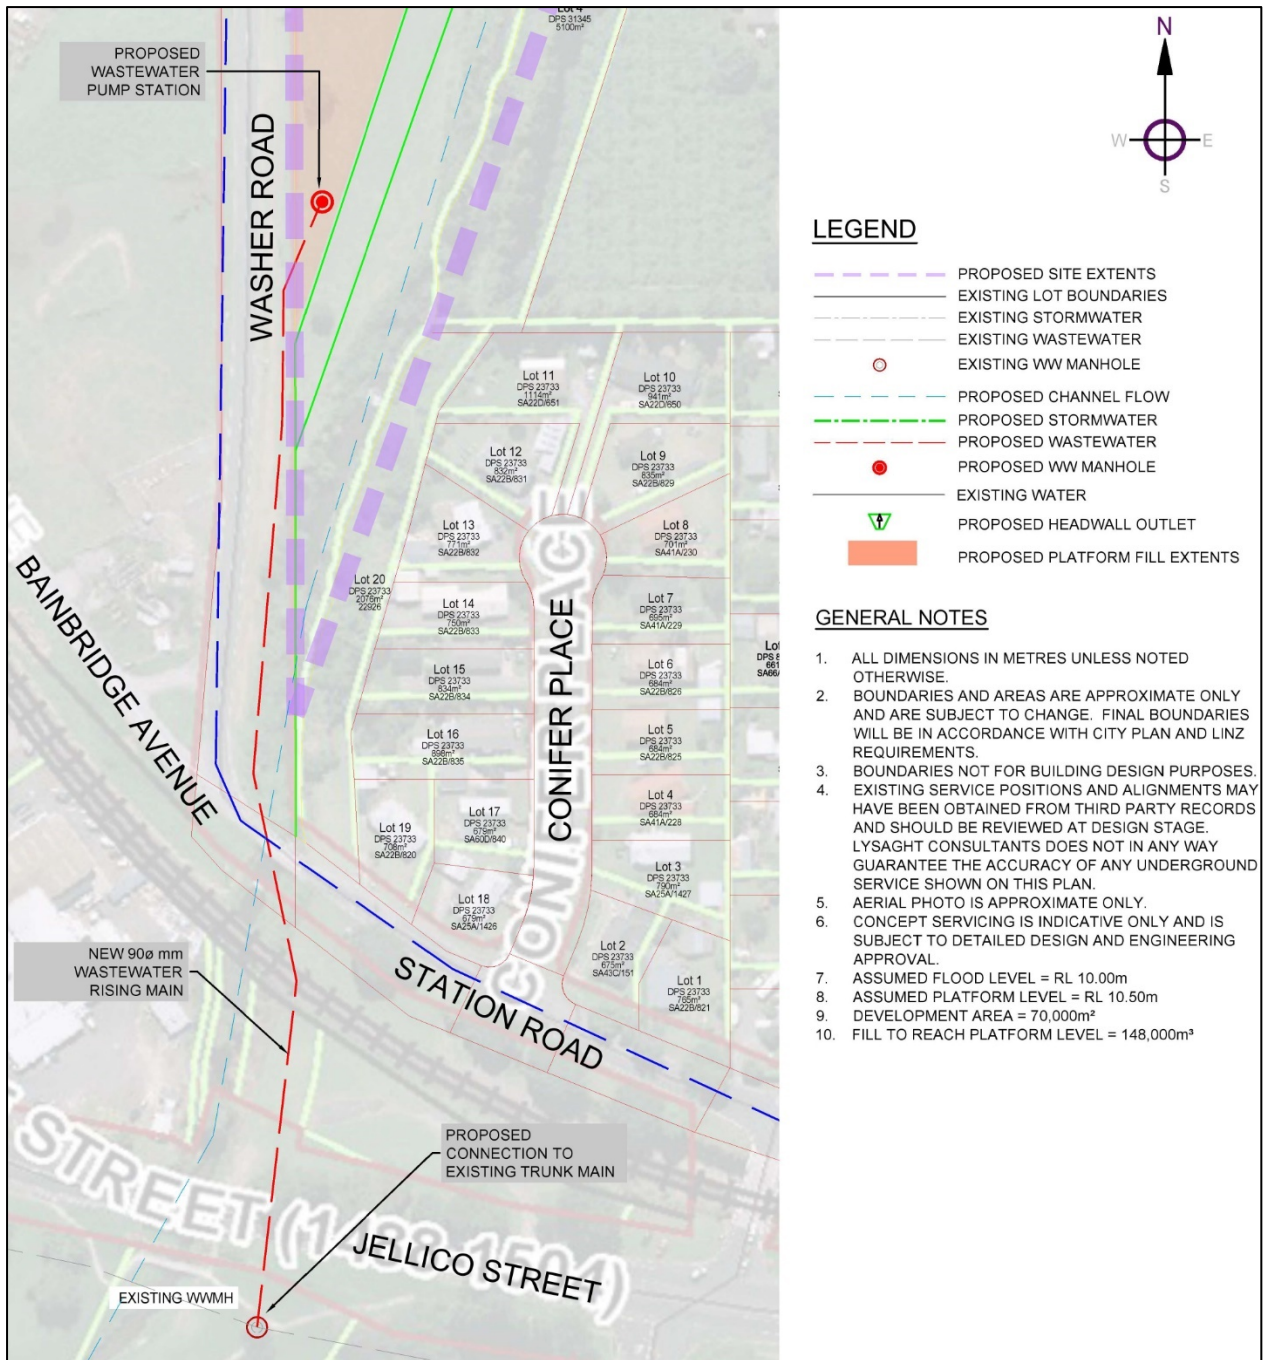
Lysaght Servicing Plan showing wastewater infrastructure
